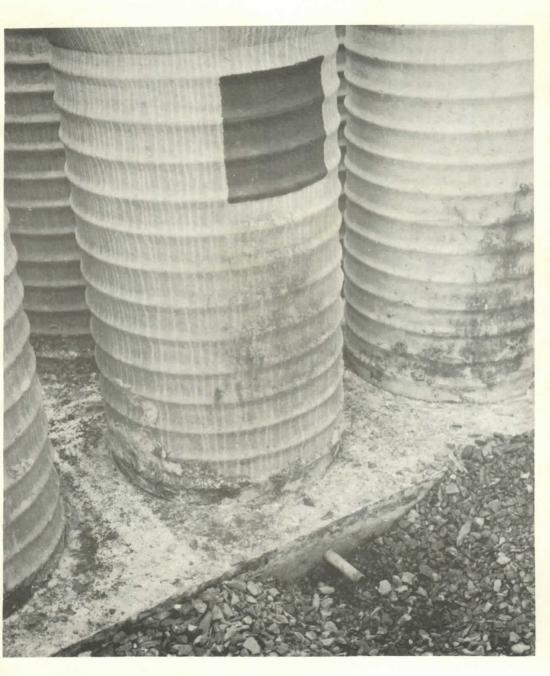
Conduits were drained by a 1" pipe leading into a layer of gravel as shown above.
